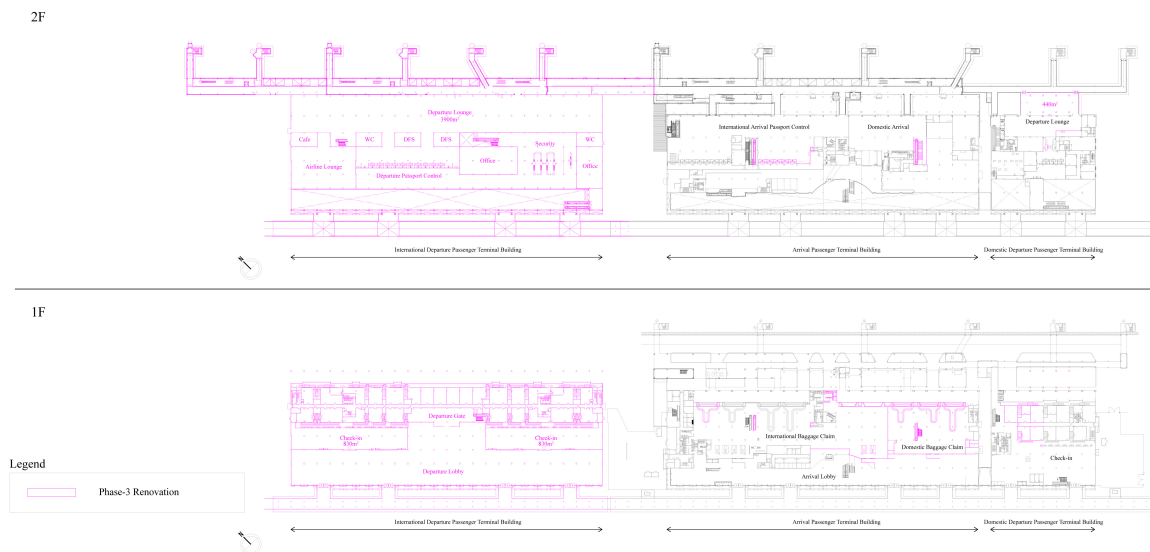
Floor Layout of New Passenger Terminal Buildings in Phase 3
